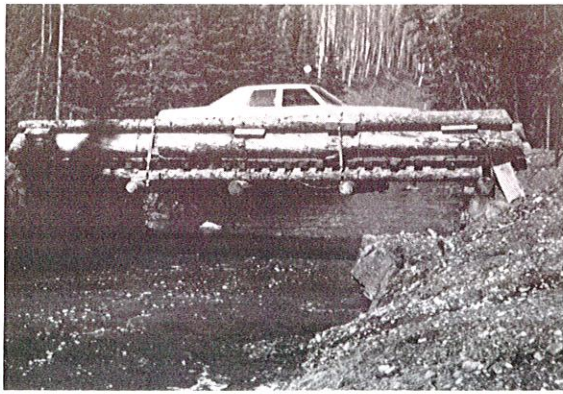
SIMPLE LOG STRINGER BRIDGE WITH GUARDRAILS.
